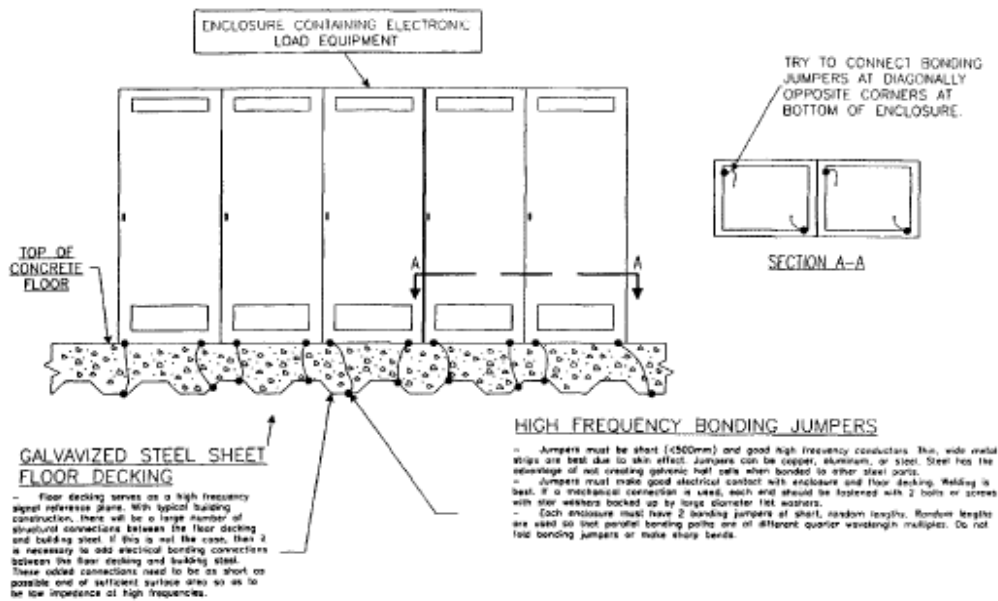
SRP utilizing galvanized steel sheet floor decking
